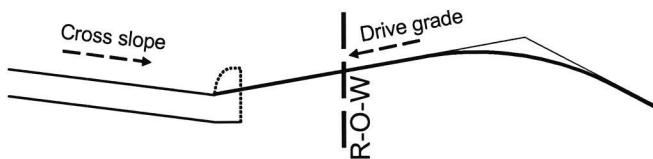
Driveway grade and roadway cross slope problems
